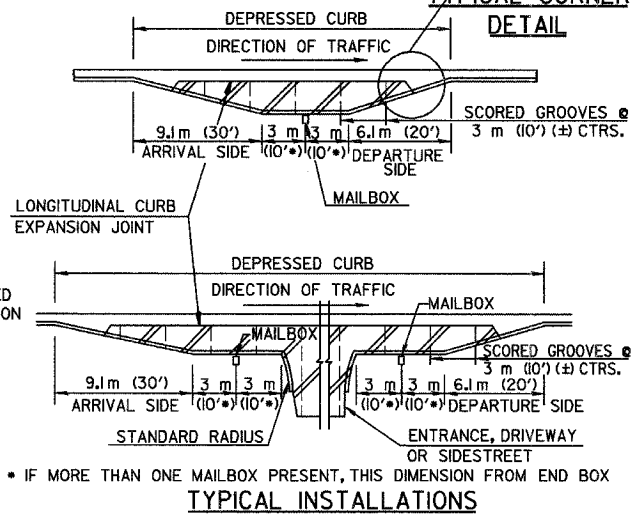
DETAIL OF MAILBOX TURNOUT IN CURB AND GUTTER SECTION
